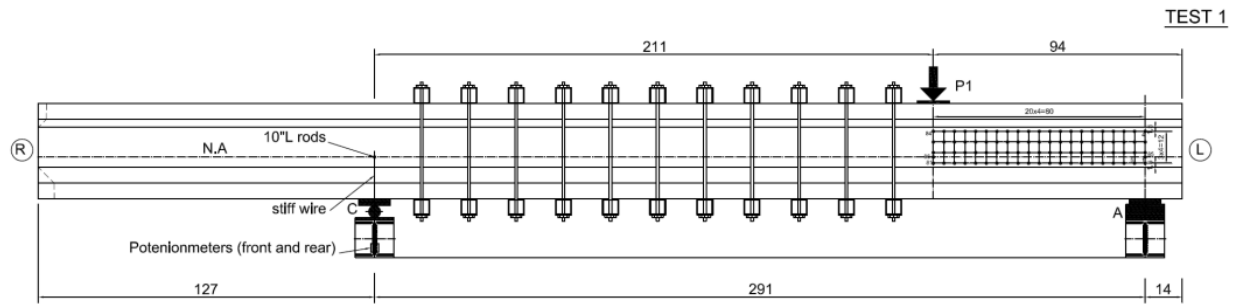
Girder 1-Test 1 Configuration (dimensions in inches)
